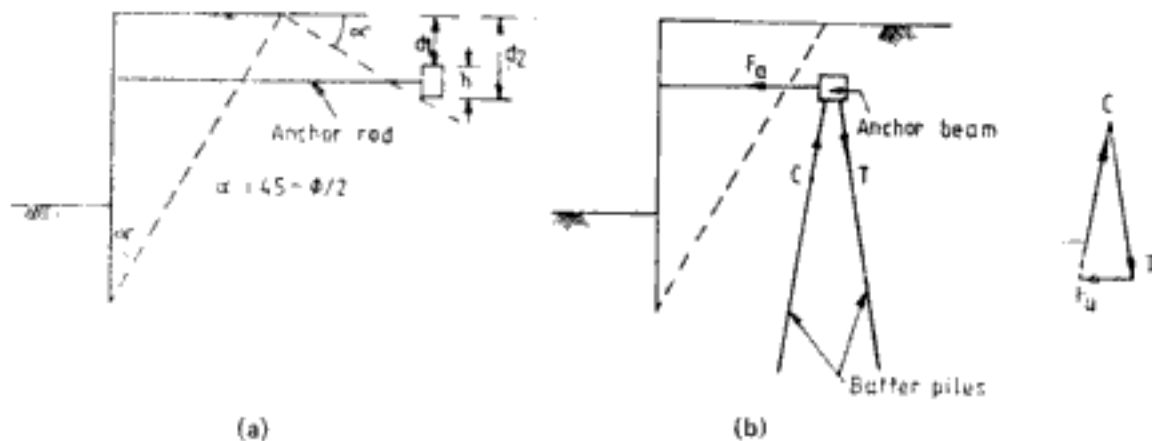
Anchorages for bulkhead: (a) deadman anchorage, and (b) anchor beam on batter piles
